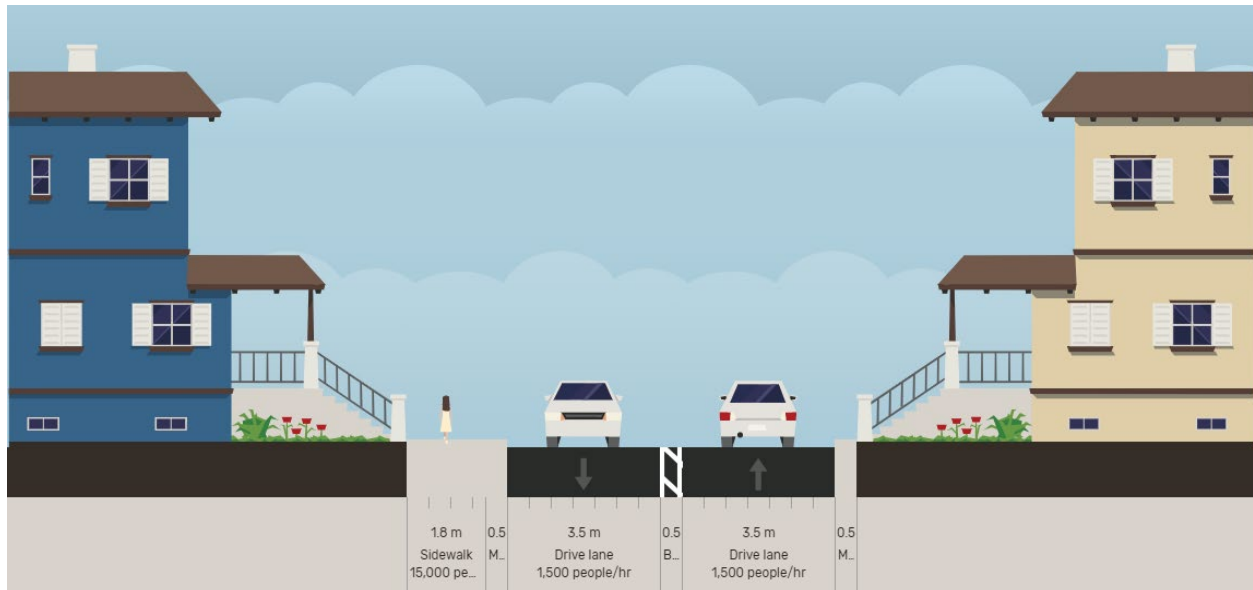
Lake Drive South: Ravenshoe Road – Bayview Avenue
